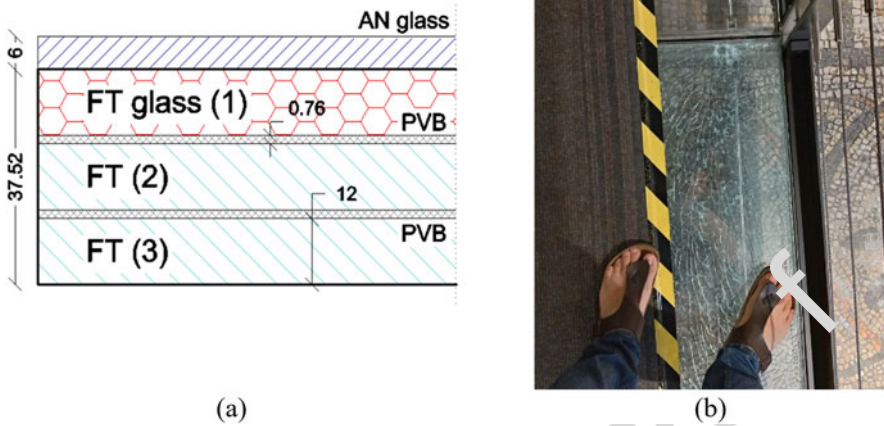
Case-study LG slab: (a) cross-section layout with dimensions in mm (in evidence, the fractured FT layer) and (b) views of LGF fractured module
